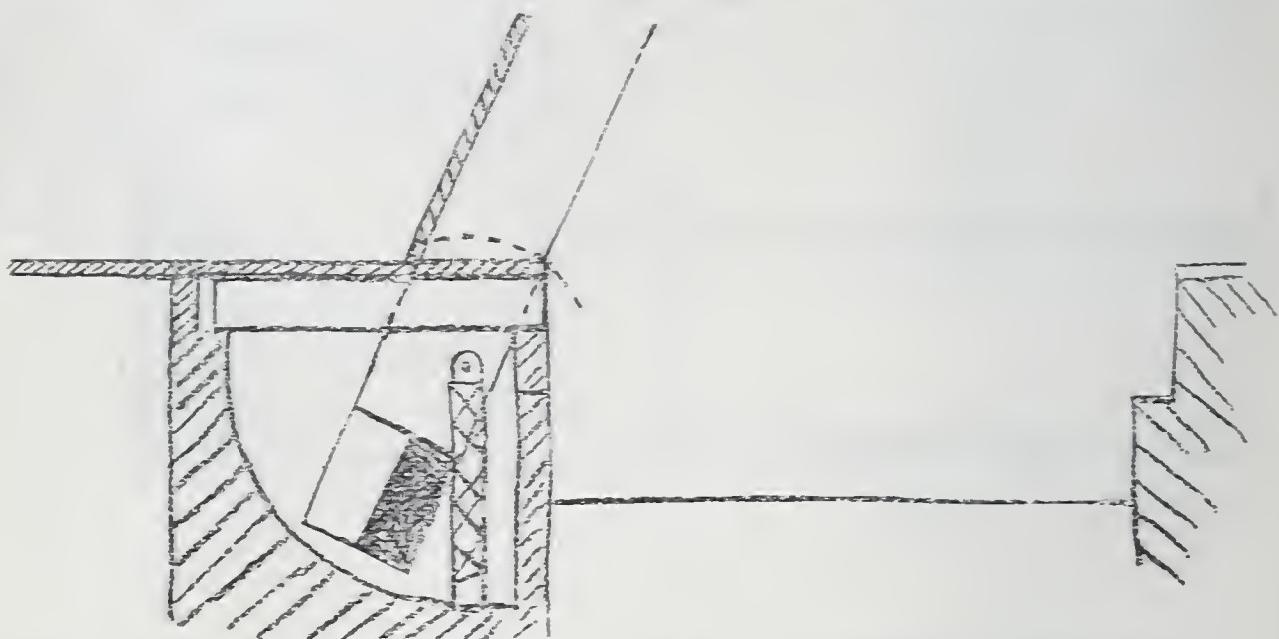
Ordinary arrangement of Roadway in Trunnion Bridges.
